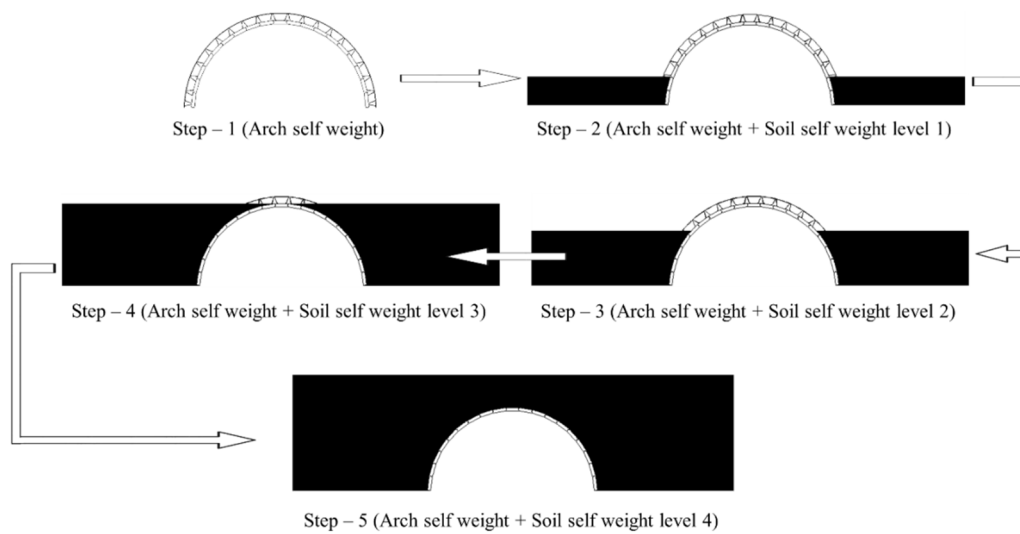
Structural analysis steps for a precast, panel-segmented arch bridge with outriggers.
